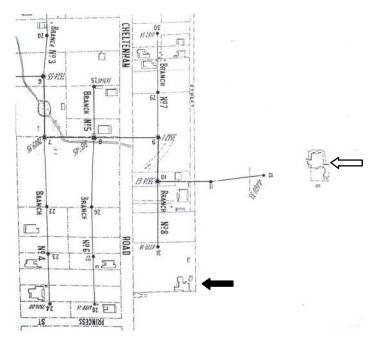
A section of a 1910 sewerage survey plan of the Burwood area. A largely wooden building named "Sobraon College" (arrowed black) was located just to the south of the alignment of Royce Avenue (not laid out by this date). The building arrowed white is likely to have been a property called "Humberstone" built by John Dawson. Aerial photographic evidence suggests that this building remained largely intact until after 1951.
